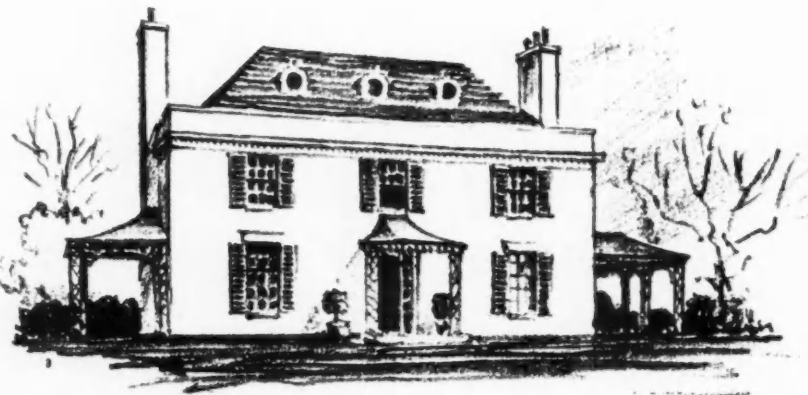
REGENCY PERIOD (Cost \$29,000). Double concrete wall with stucco on frame.
